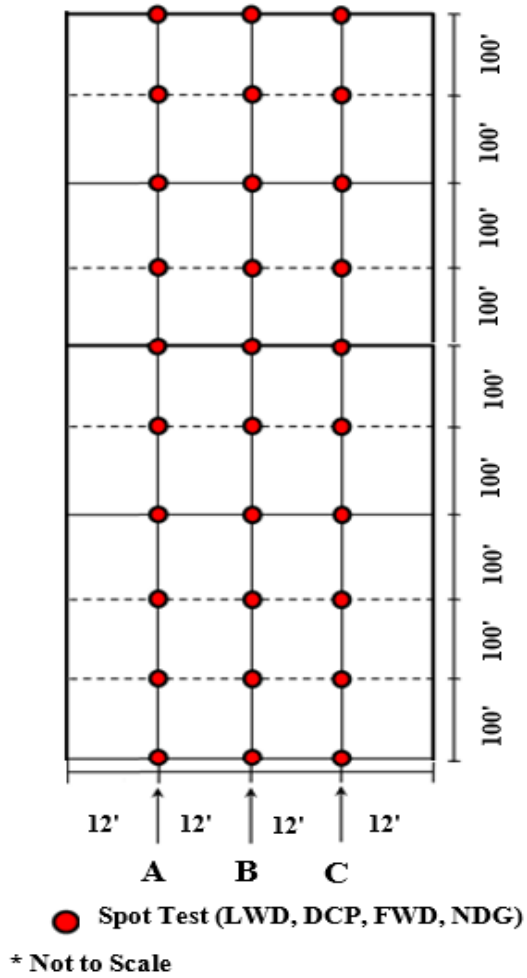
Schematic of the typical test section and location of spot tests.
